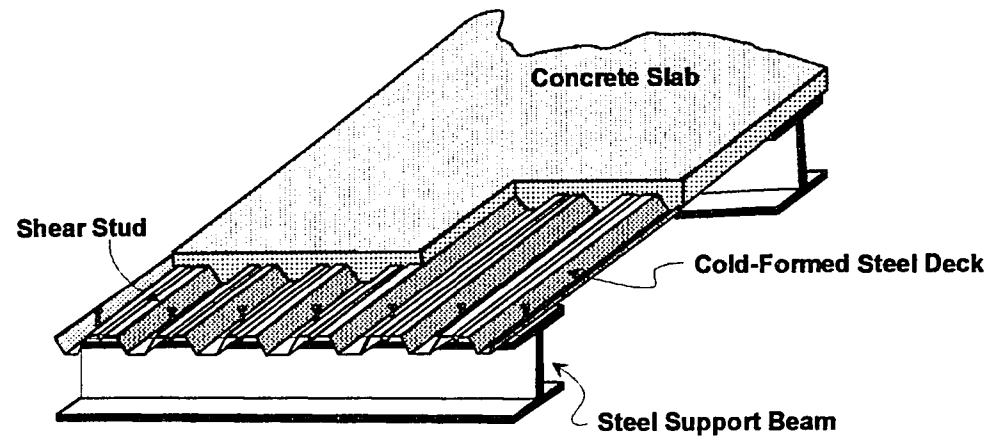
Typical steel-deck-reinforced concrete slab (modified from Reference 78)
